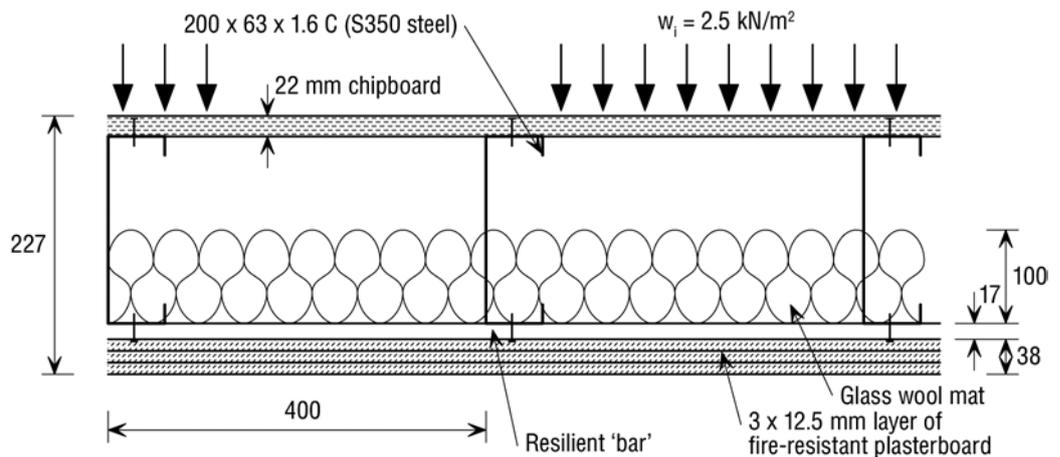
Cross section through the light steel test floor for 90 minutes fire resistance.
